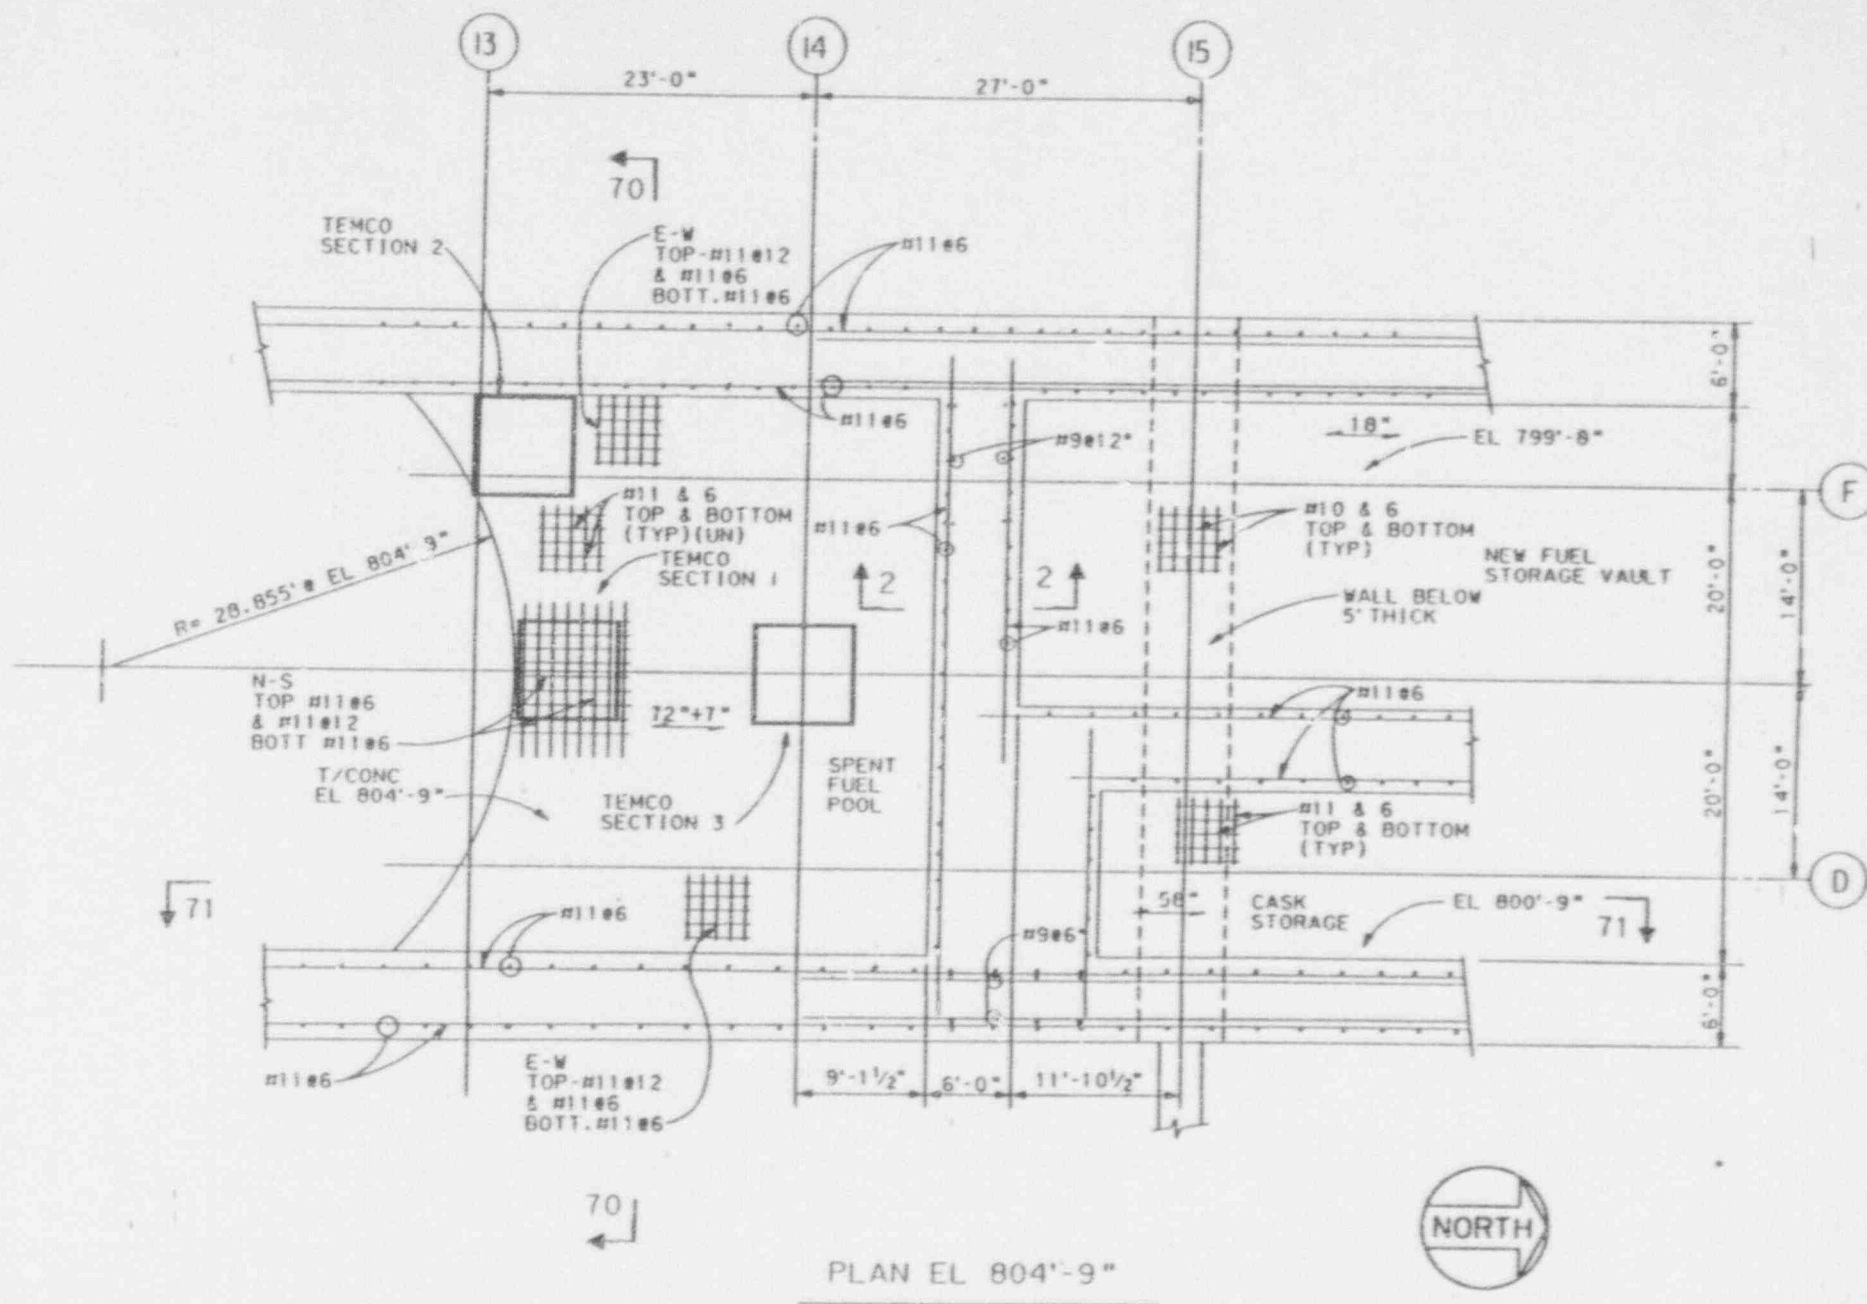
LASALLE SPENT FUEL POOL FLOOR PLAN
